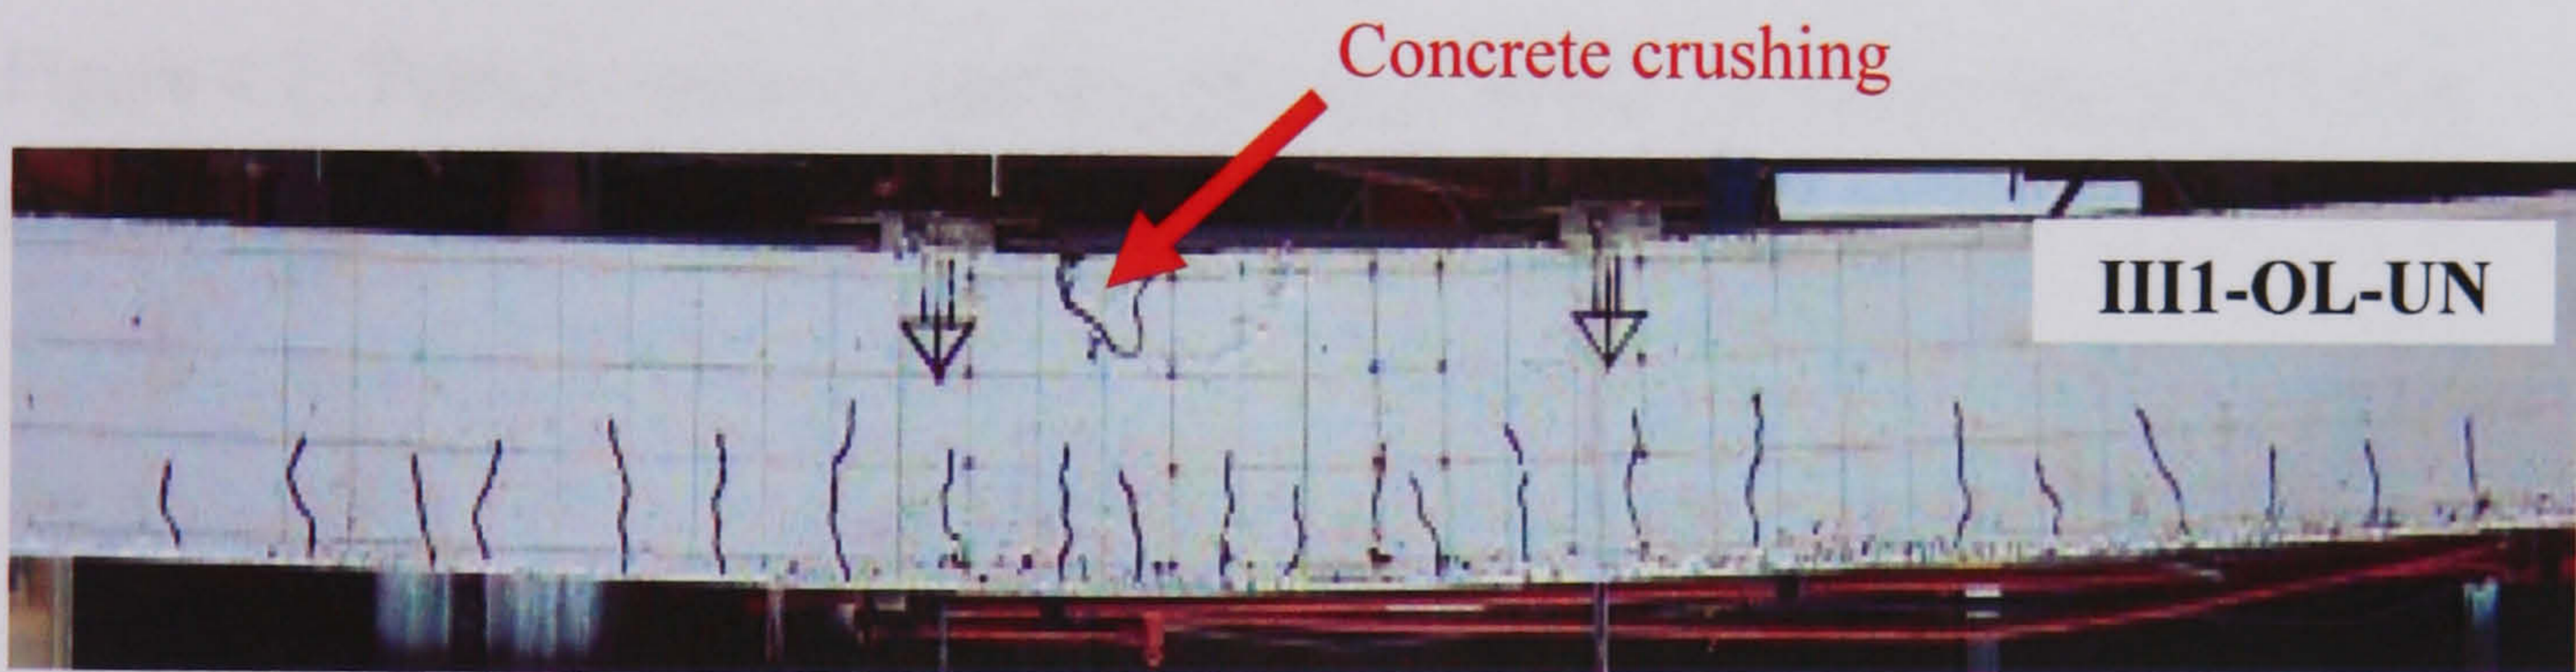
Typical flexural failure due to concrete crushing at the mid-span of the over-reinforced unstrengthened beam III1-OL-UN
